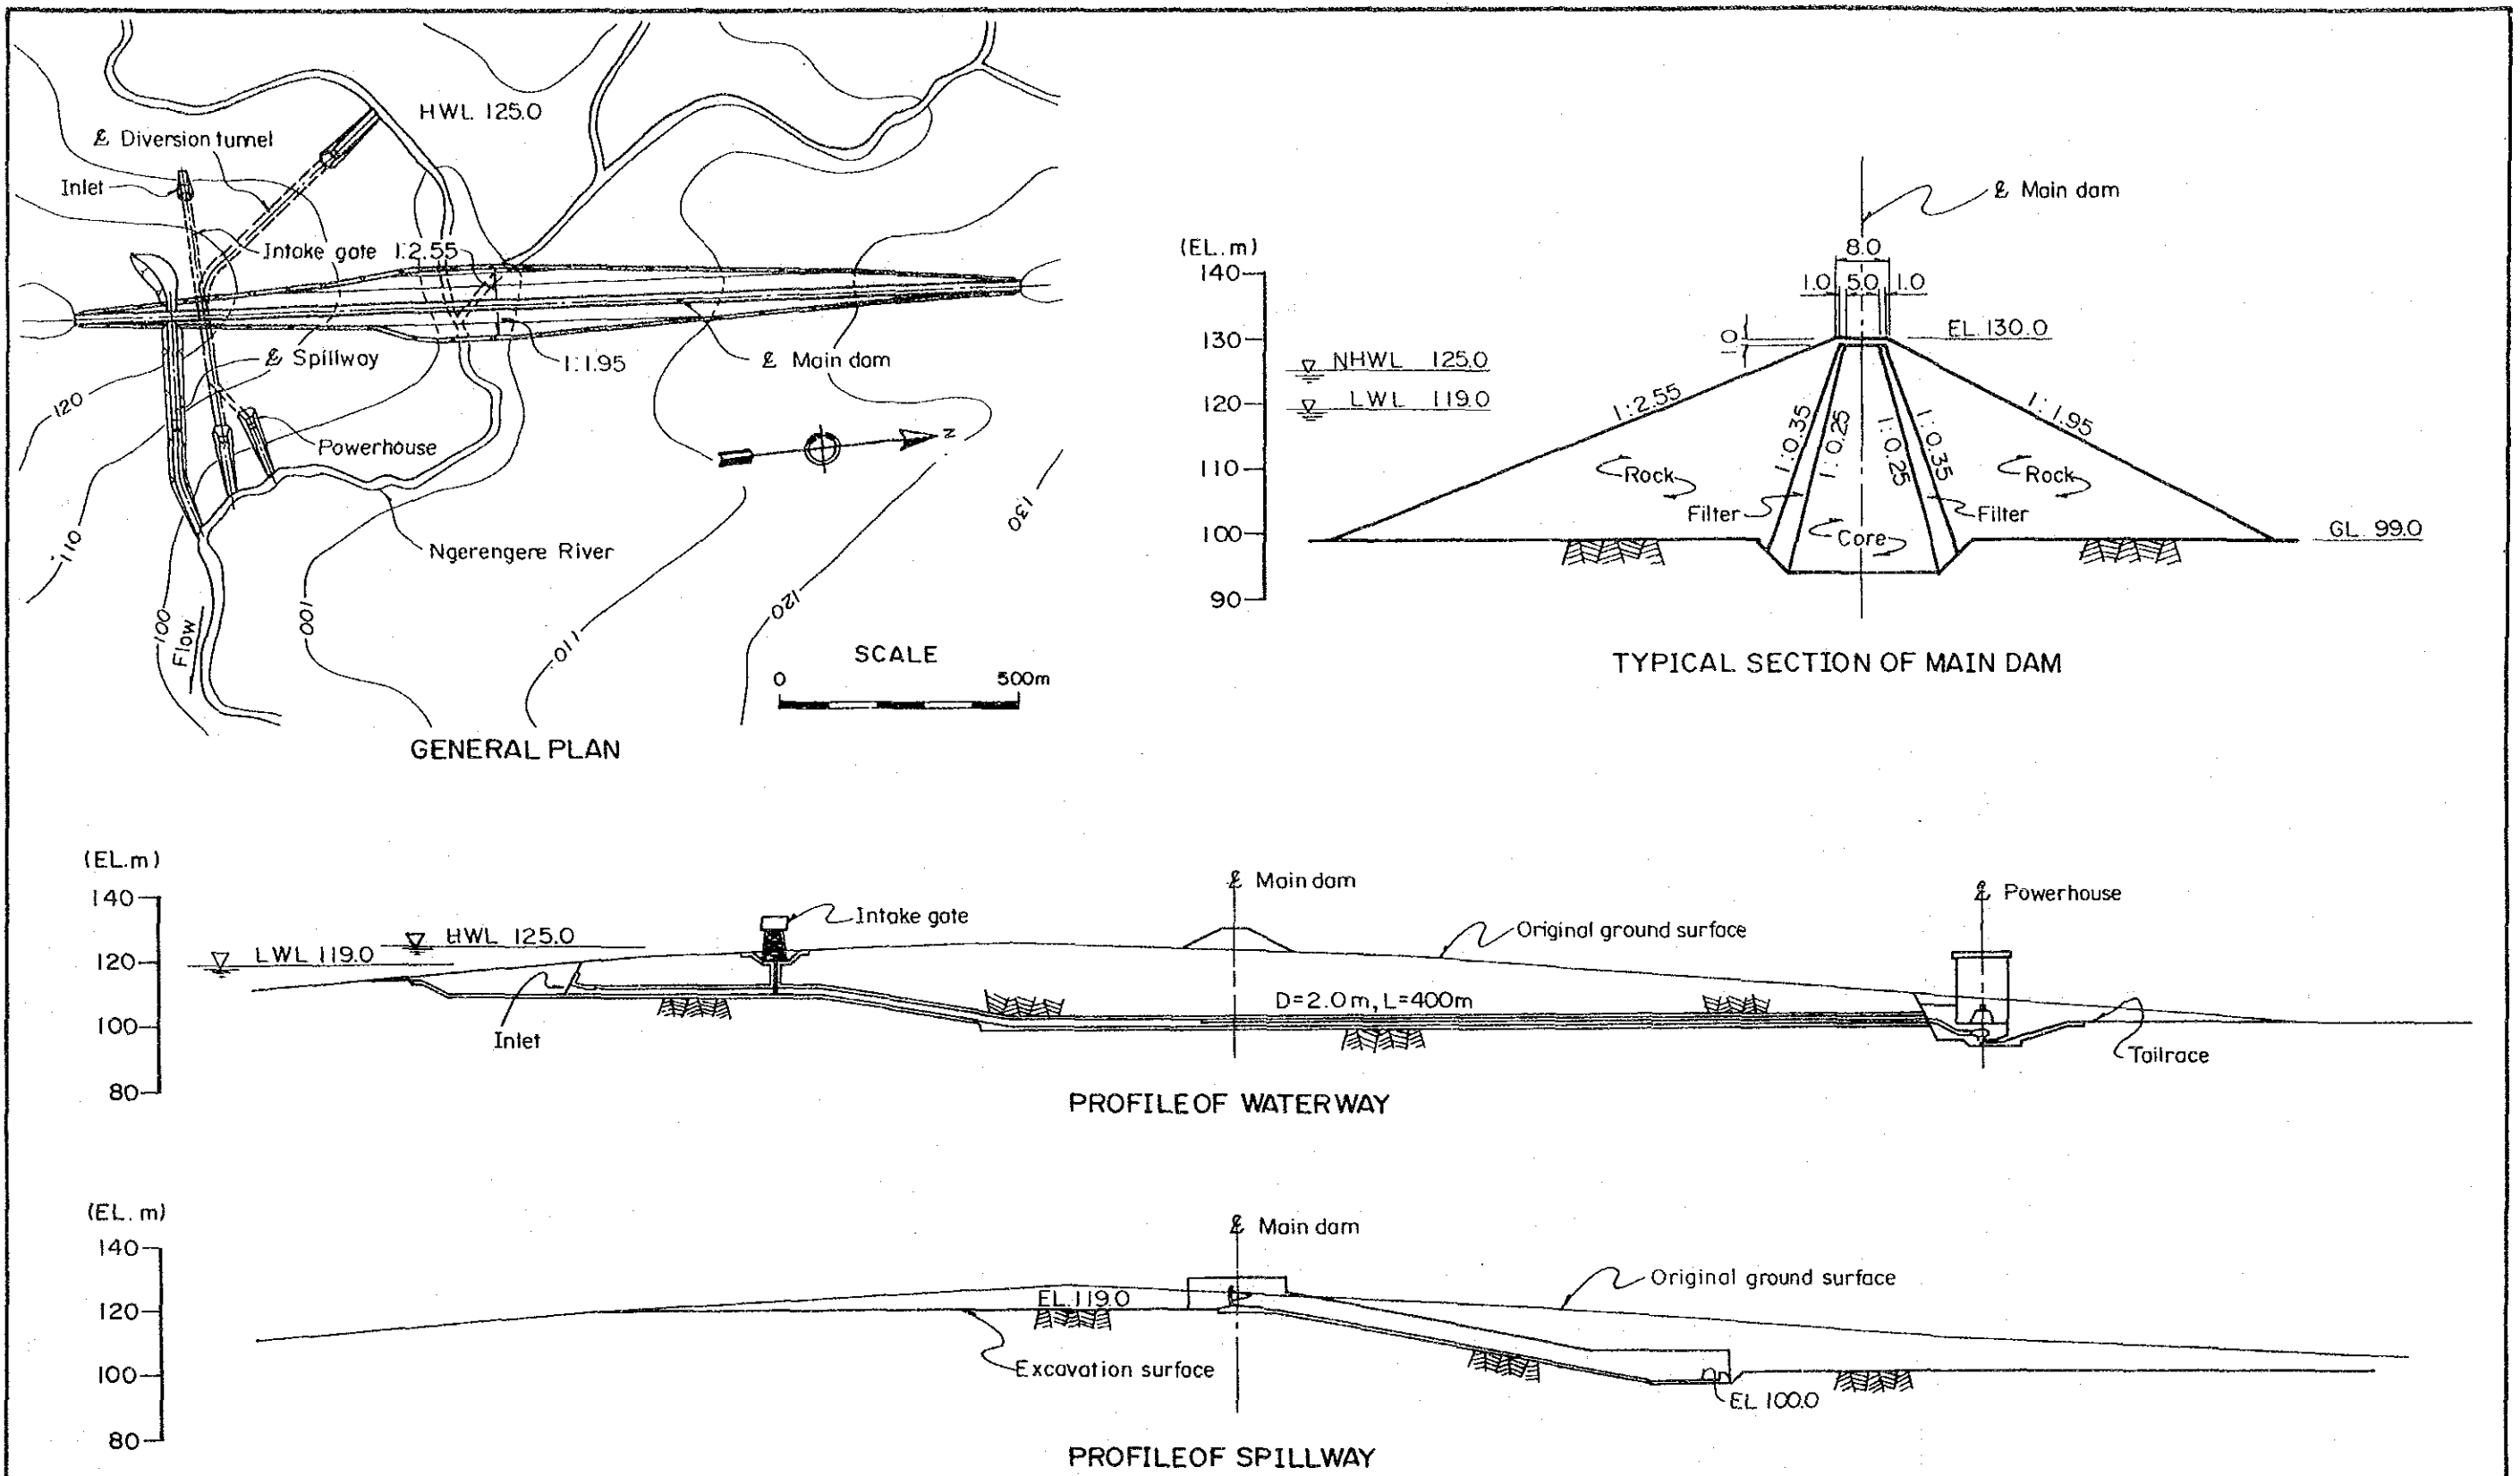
LAYOUT PLAN OF NGERENGERE DAM PROJECT
